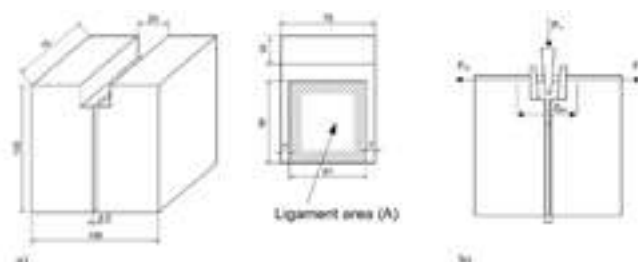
(a) Wedge splitting test shape and dimension in mm and (b) testing setup
